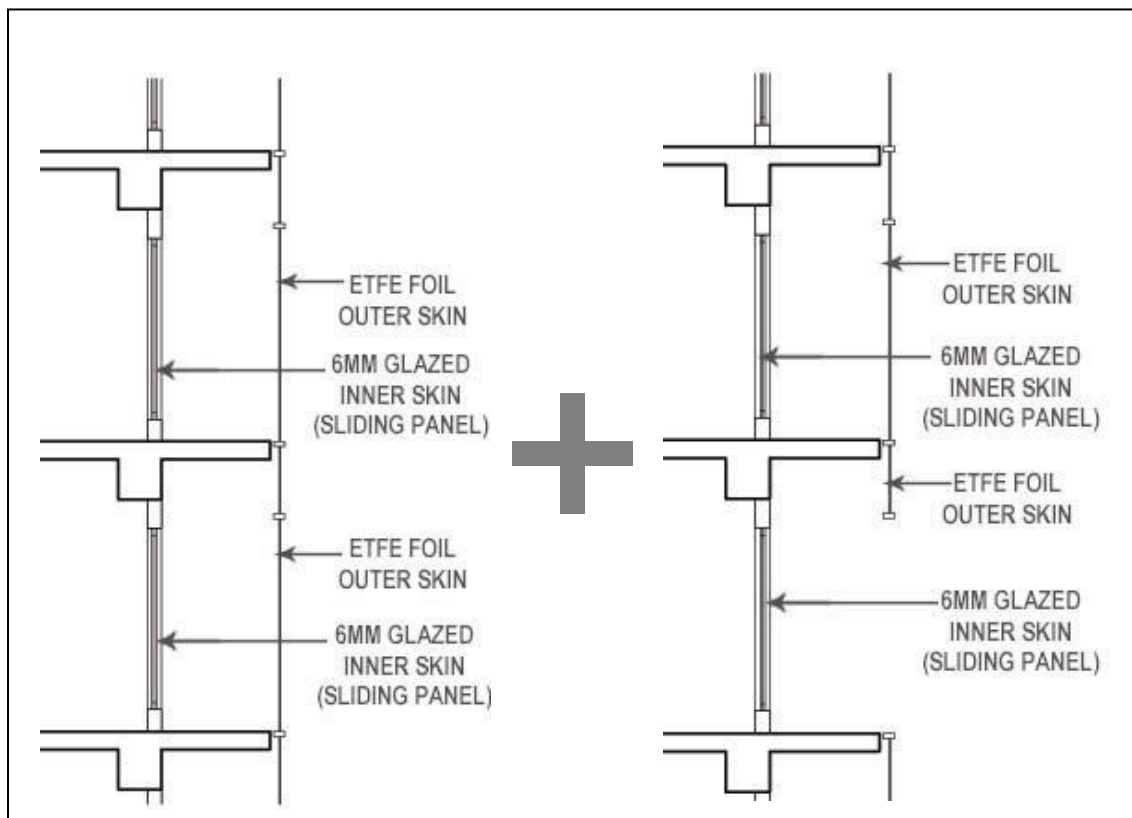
Case 5 Typical Section, Image Source- Cad Drawing
